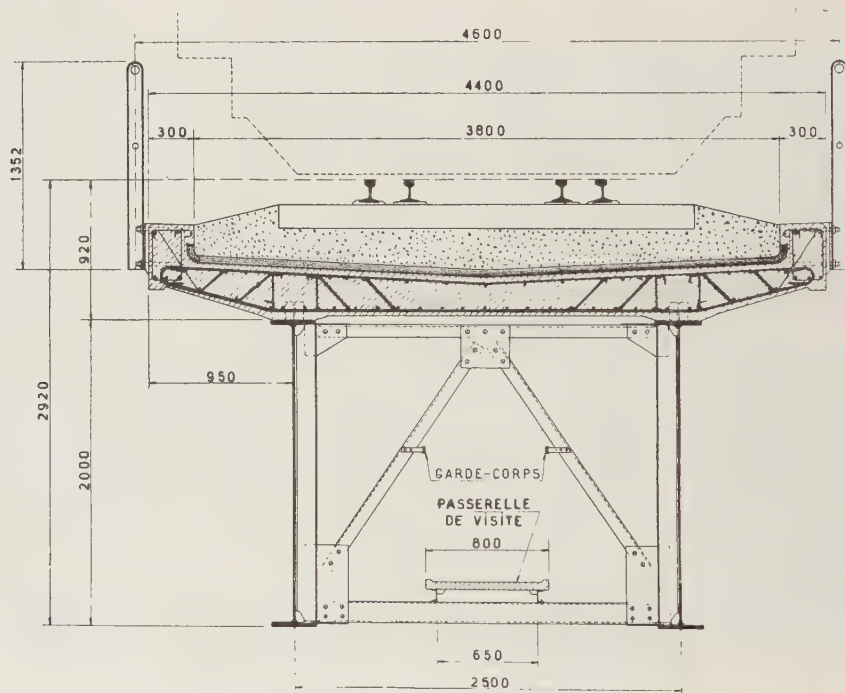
Transverse section of the Bärschwil metal railway bridge.
